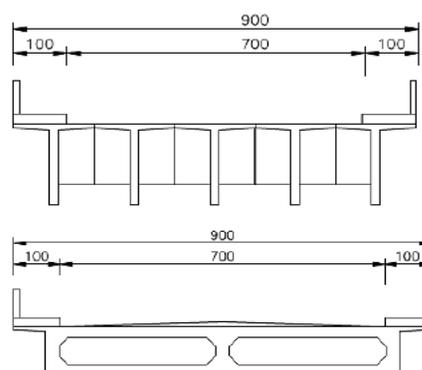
The bridge superstructure consists of a simply supported T beam and a pre-stressed continuous box girder (unit cm).
